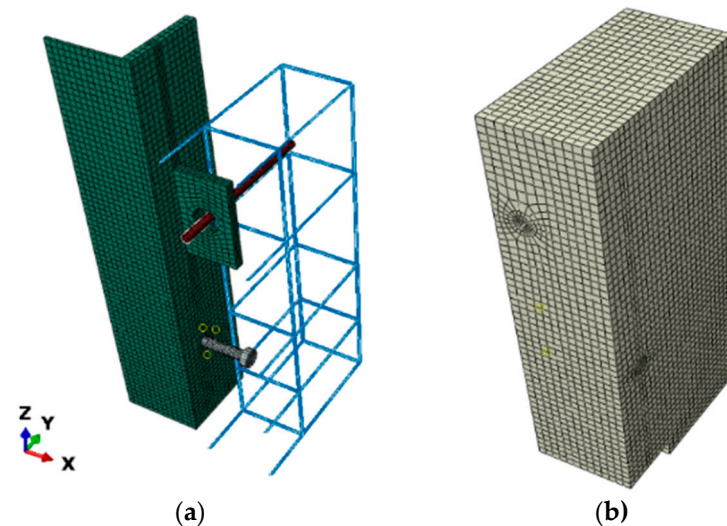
1/4 Finite element model (FEM) of push-out test for the composite shear connector: (a) The model of Steel member and steel bars; (b) Concrete slab model.
